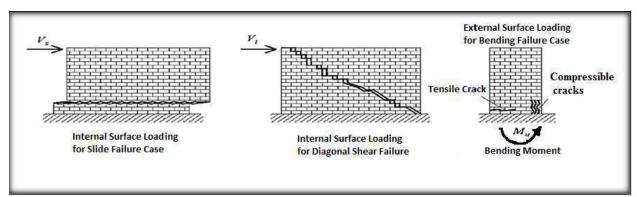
Diagram of the failure patterns by loadings on brick walls inside and outside of surfaces
